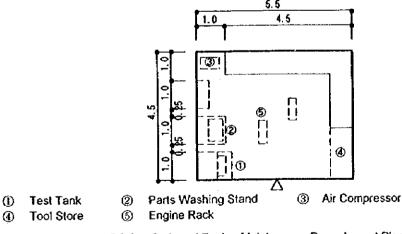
Outboard Engine Maintenance Room Layout Plan
